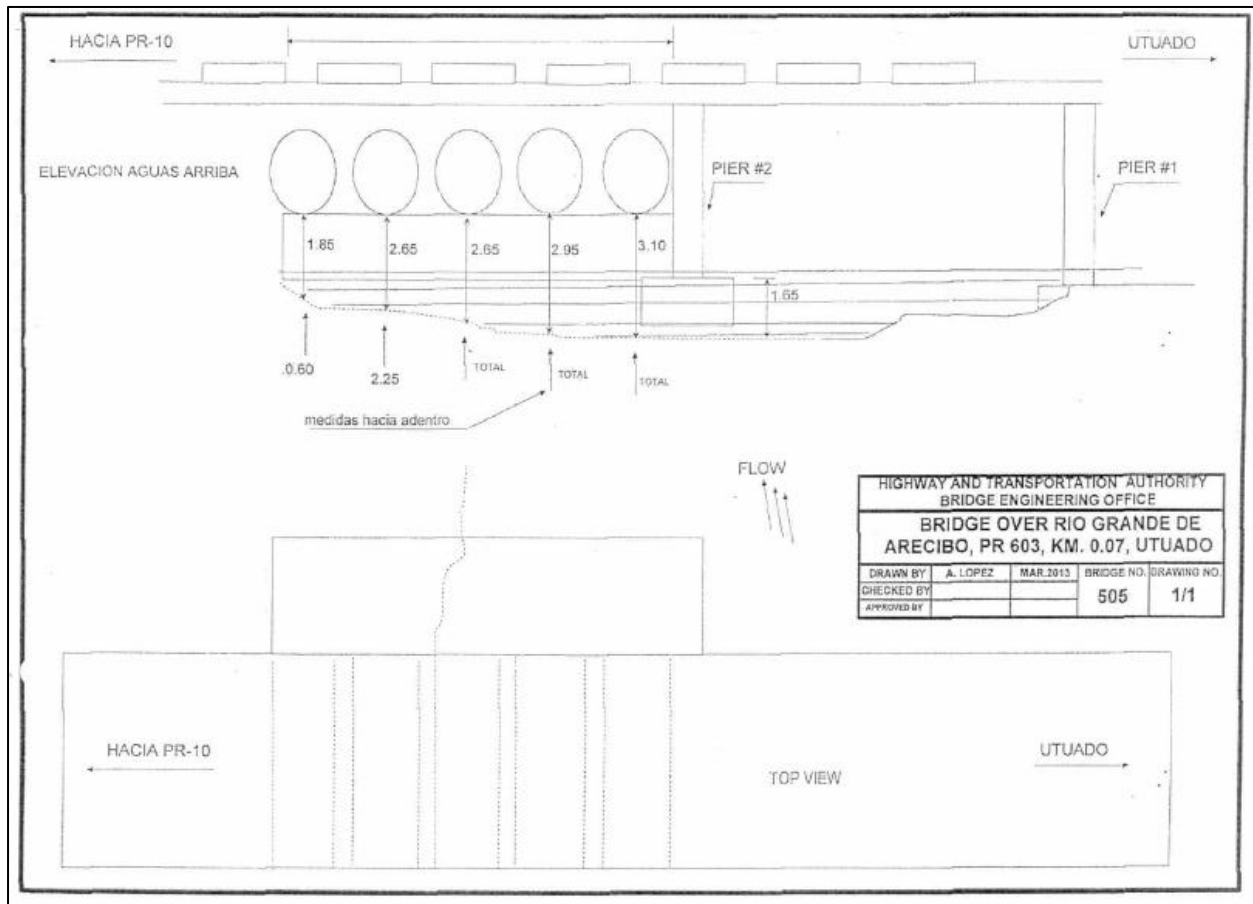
Bridge 505 drawings (source: PRHTA)
